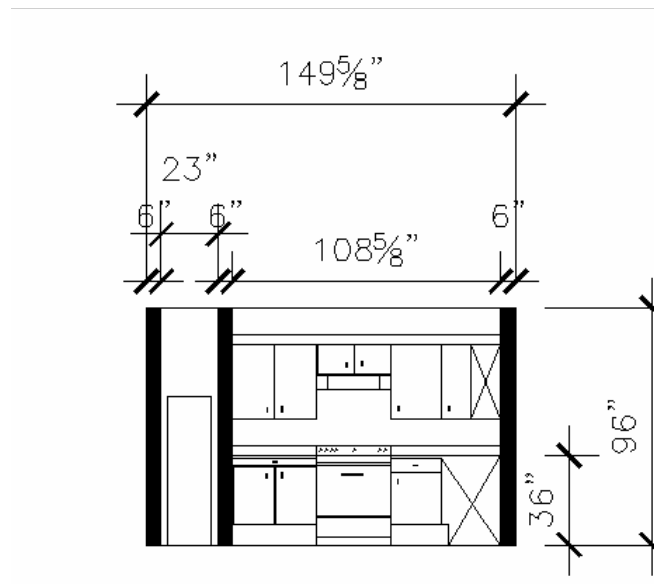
Plan C Kitchen Floor Plan Dimensioned
